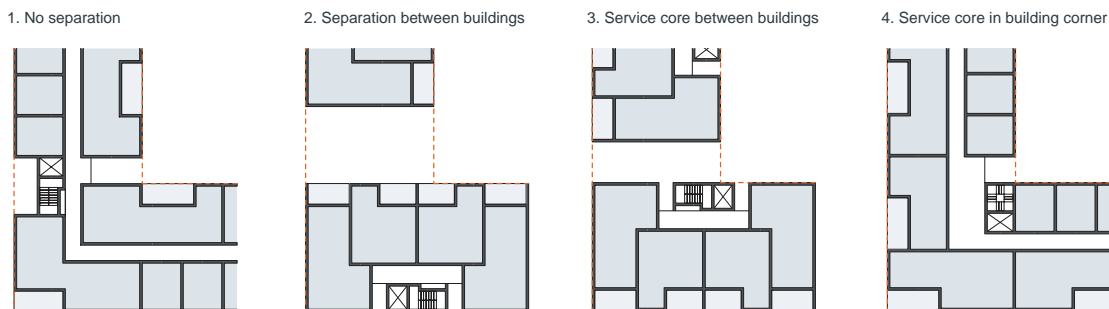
F.2 Alternatives to respond to built form corners, location of access cores, building separation and apartment configuration
